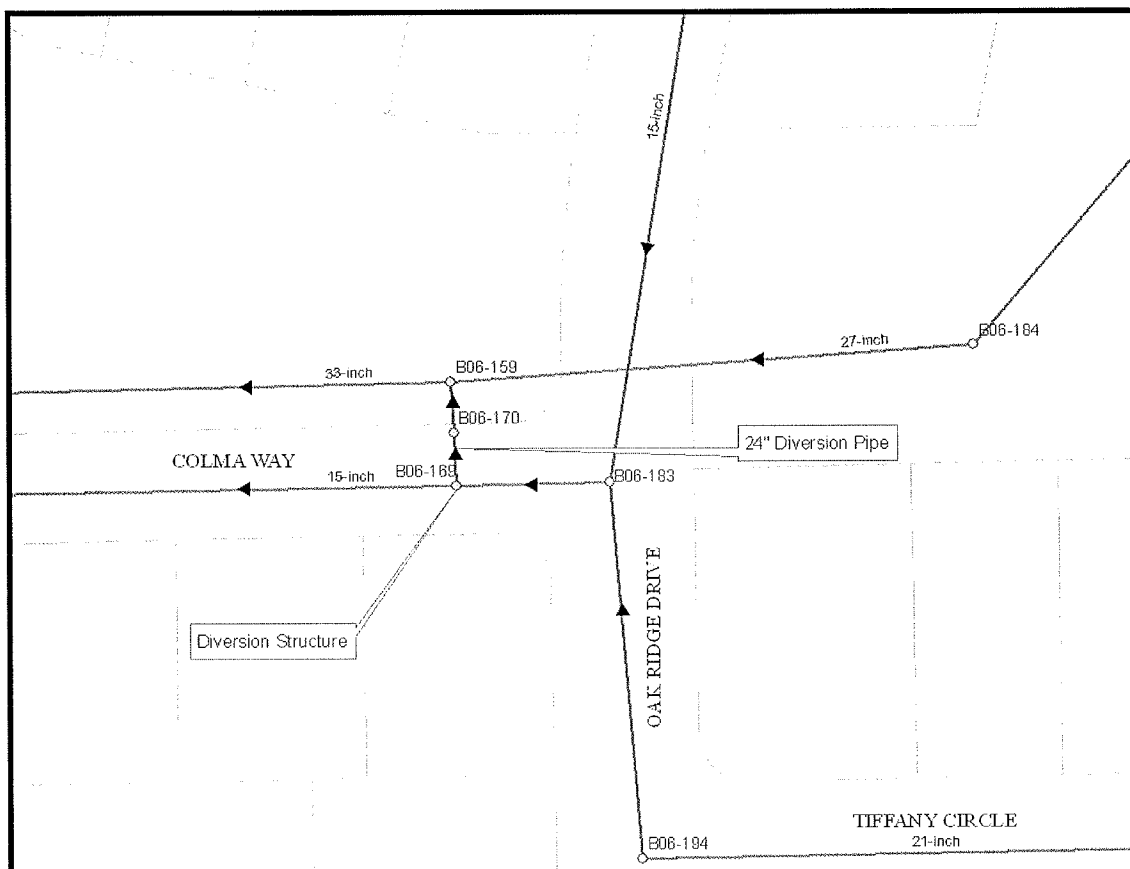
Roseville Trunk Sewer Diversion at Manhole B06-169
